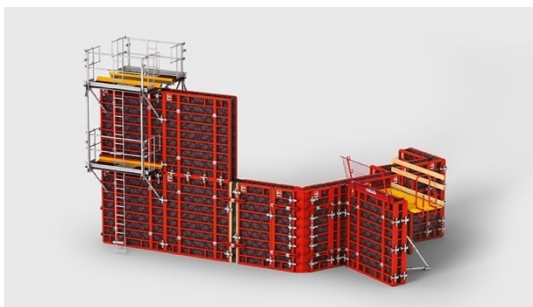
TRIO Wall formwork with standard panels up to 3.30 m x 2.40 m
